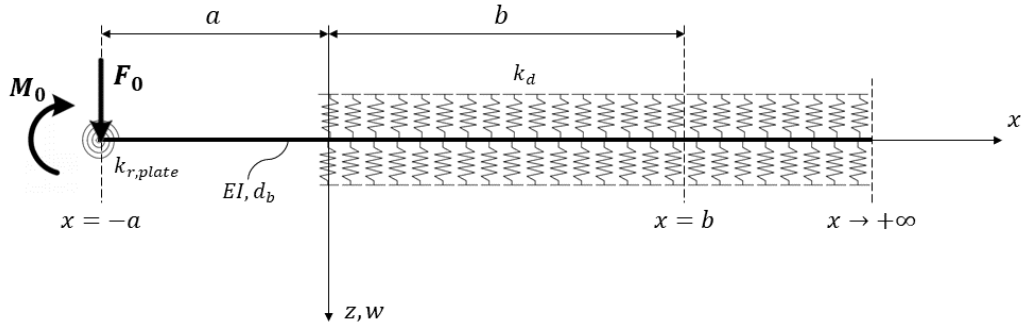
Structural scheme of dowel embedded in concrete as a semi-infinite beam on elastic foundation
